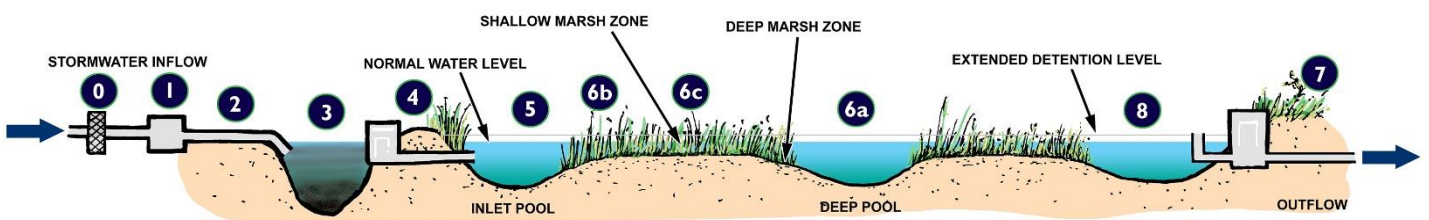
Components of constructed wetland – elevation (Source: Adapted from E2DesignLab)
